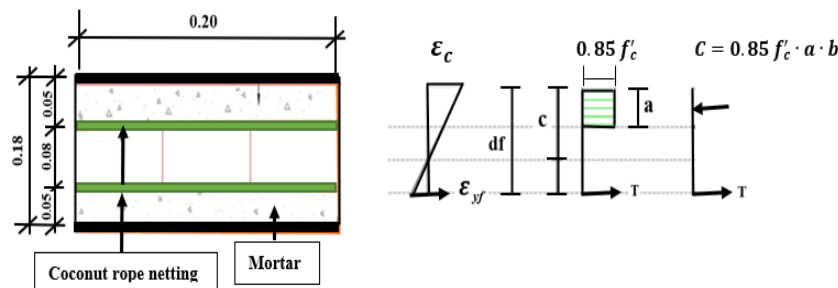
Free body diagram of the cross section of masonry wall strengthened with coconut rope netting
